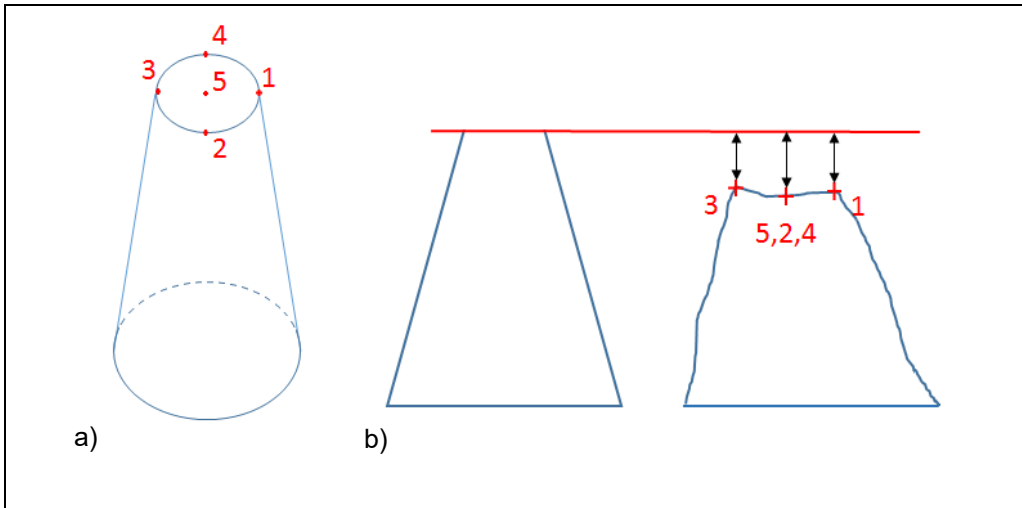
a) Perspective view of the mold b) Slump test and measurement
